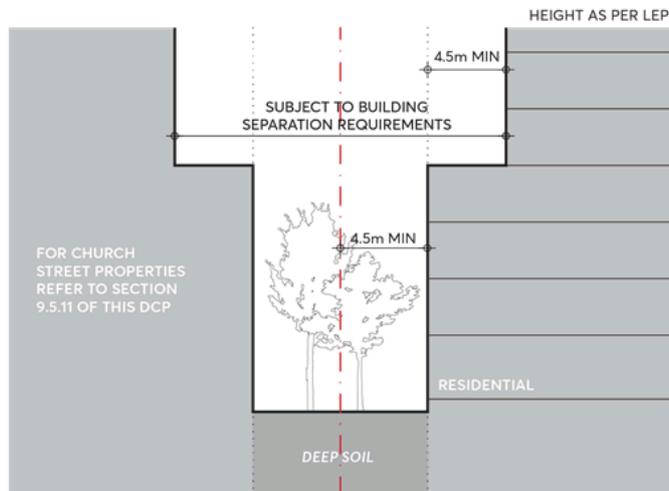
Setbacks and separation with properties fronting Church Street (site 07, site 08 and site 11)
